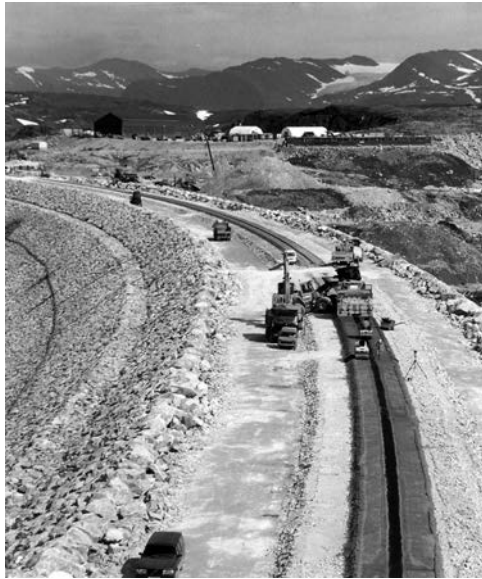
Storglomvatn dam, during construction (courtesy Mr. Helge Saxegaard).
